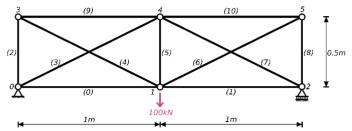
Simply-supported cross-braced planar truss system with a single central vertical point load.
